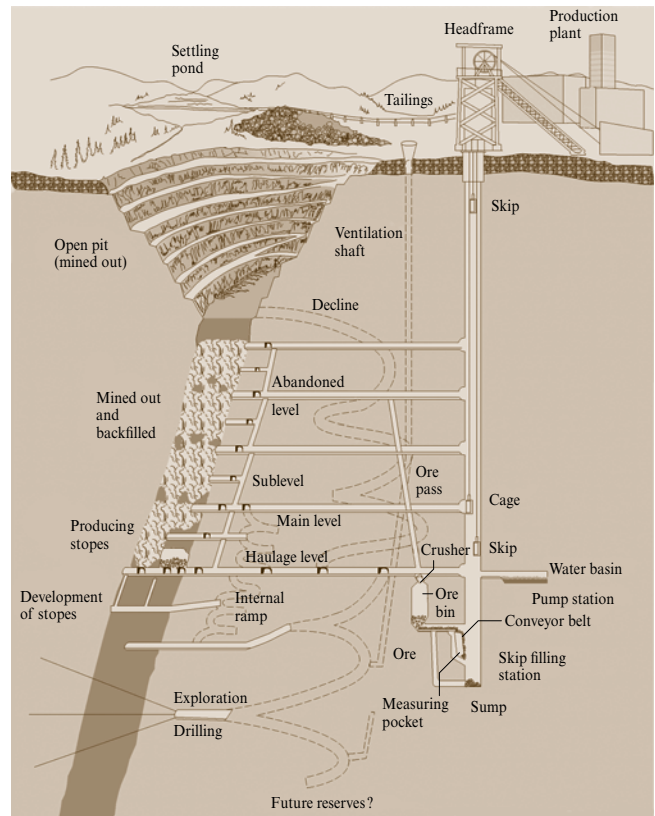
Typical hardrock mine layout also showing transition between surface and underground mining [49.5]
